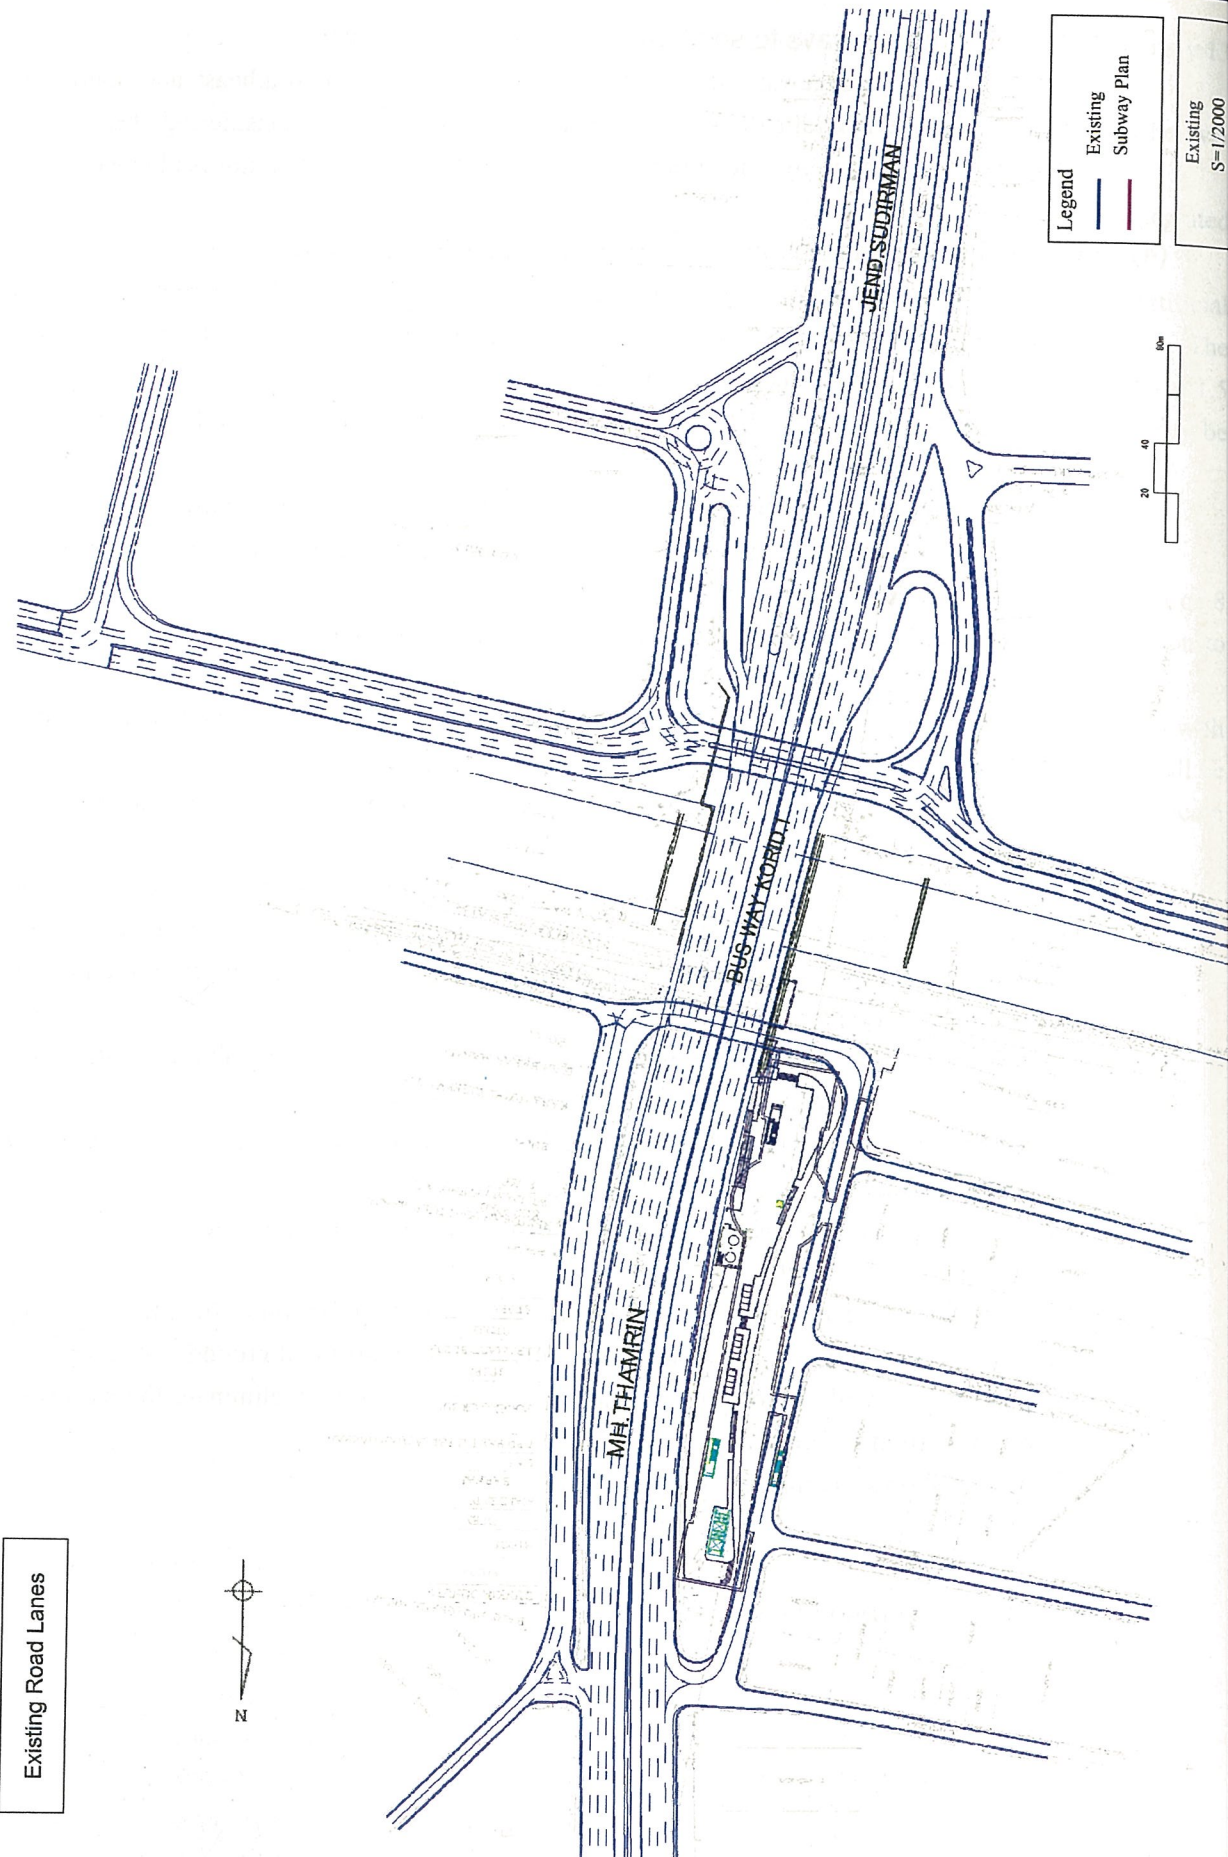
Existing Road Lanes (Source: Study Team)
